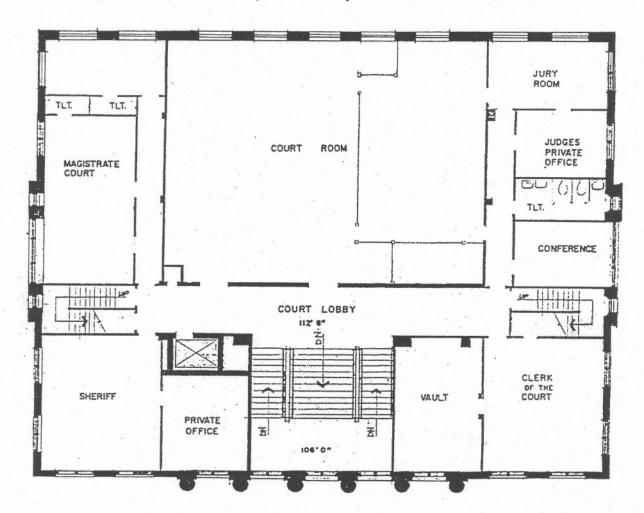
Late 19th -Early 20th Century Courthouse Plan-Second Floor
